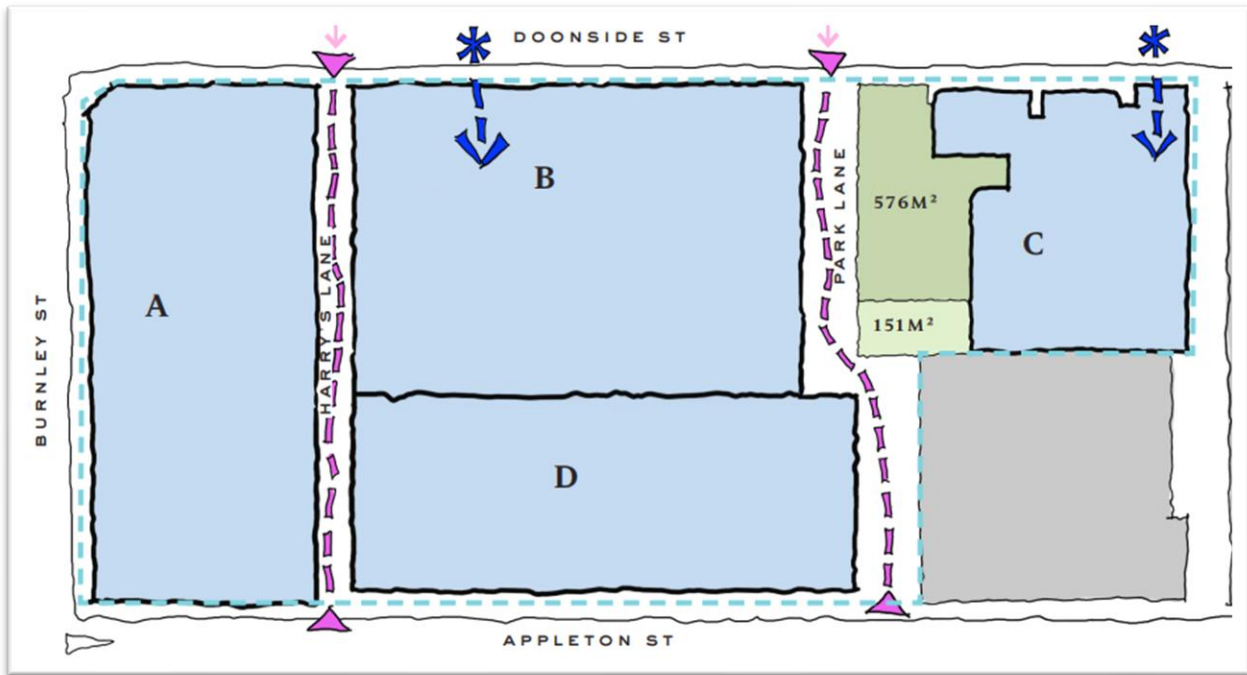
Proposed Masterplan. Source: Development Plan (Gurner 2023)
